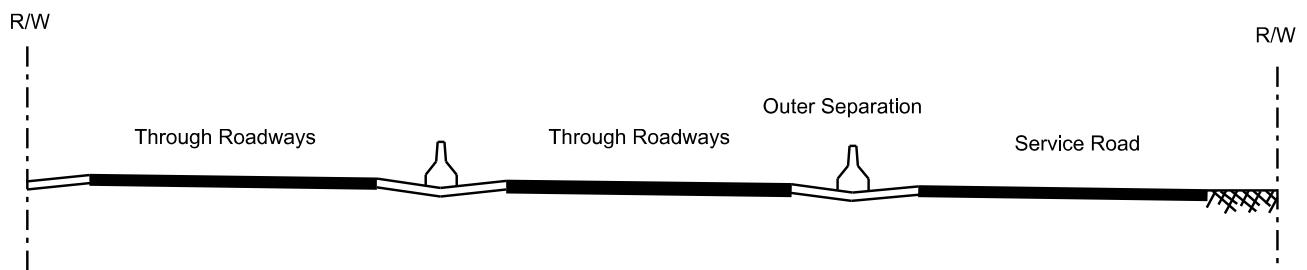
Typical Cross Sections for Ground-Level Freeways
